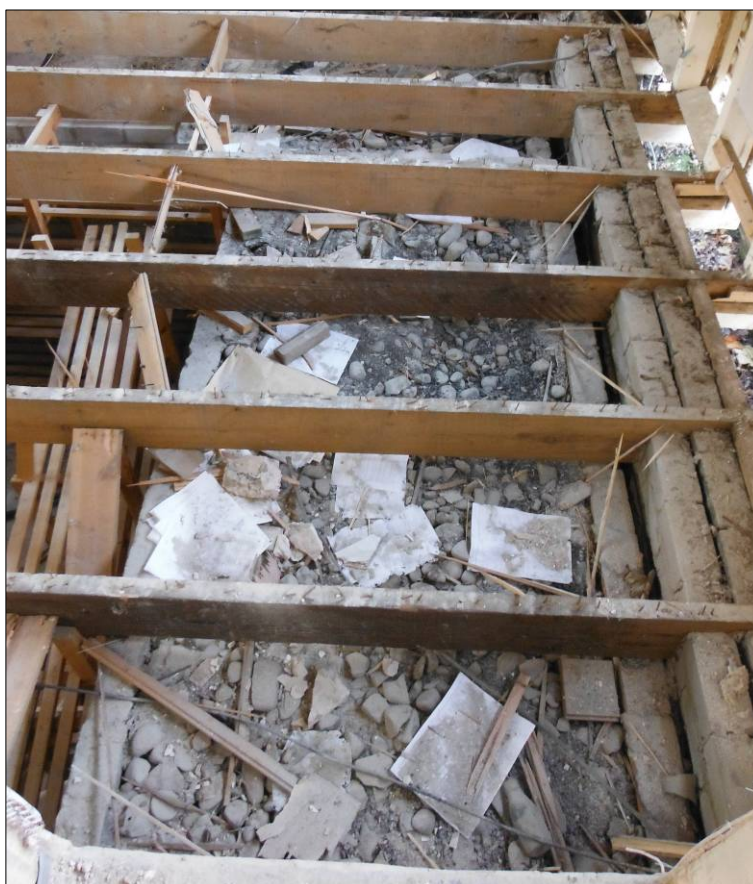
In-filled brick structure below the floor of Building F, viewed from the easternmost inserted doorway in the northwest elevation of Building C.
